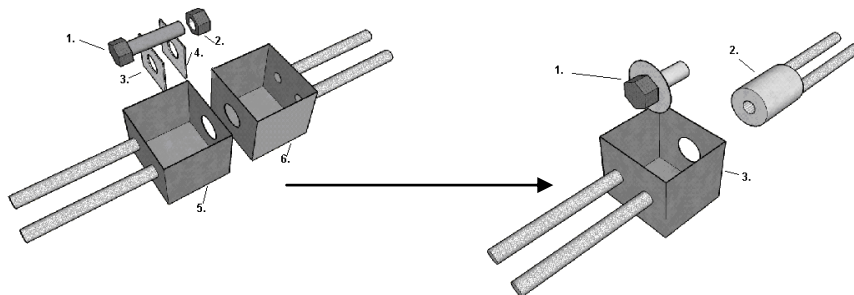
Sketch of floor-to-floor/wall-to-wall connection, before and after part reduction.
